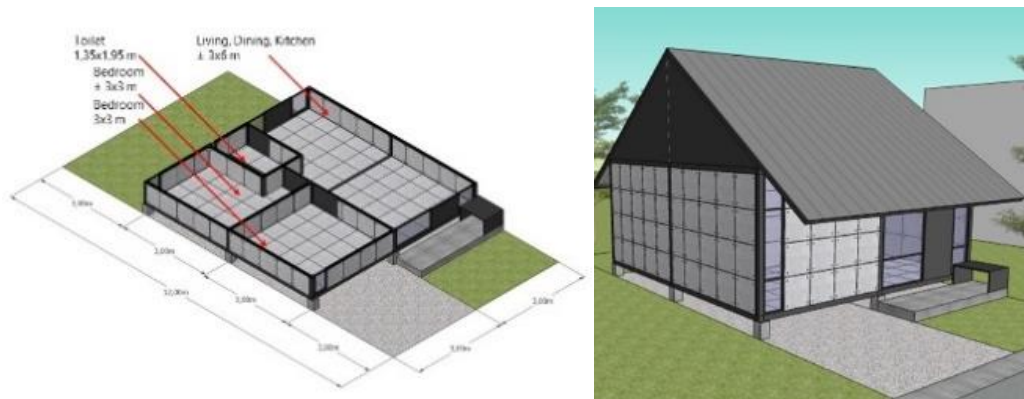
Isometric 3D Plan and Perspective View of Prefabricated Low-Cost Housing Prototype Design
